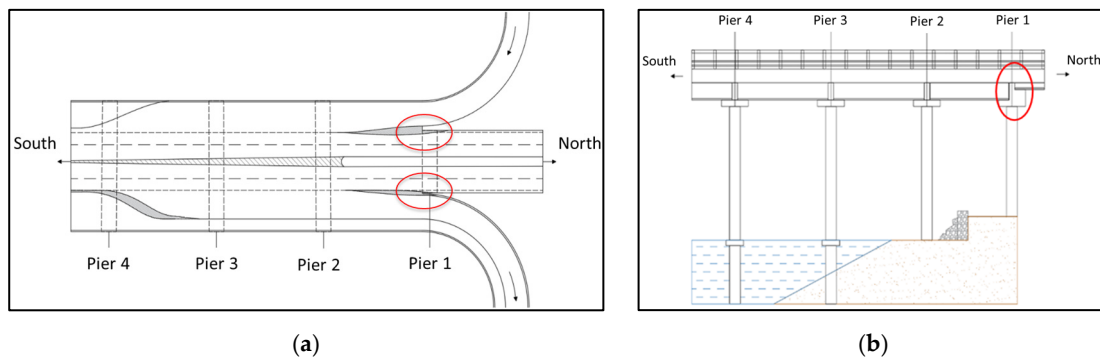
Inspected sector on the large bridge (Pier 1). (a) Plan view; (b) Elevation view (the red circles show the exact location to be analyzed for cracks or fissures).
